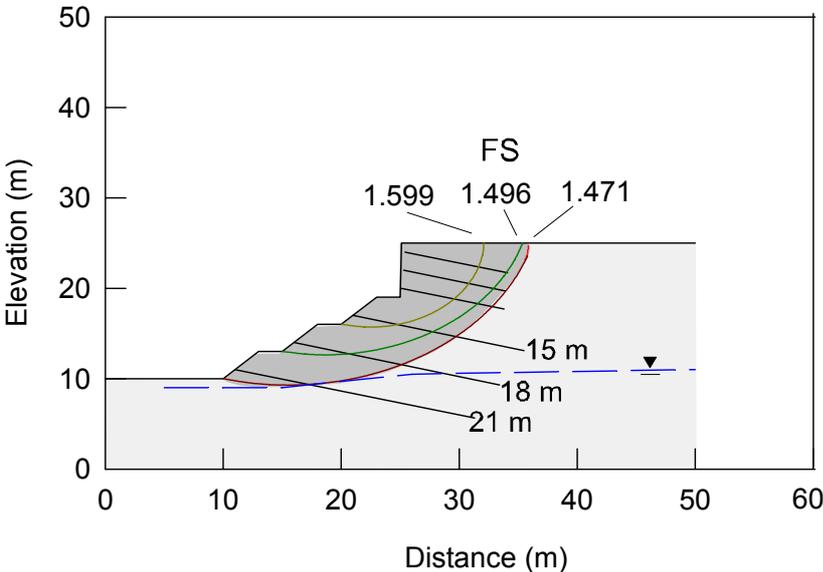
Example of wall close to Congonhas Airport, São Paulo
